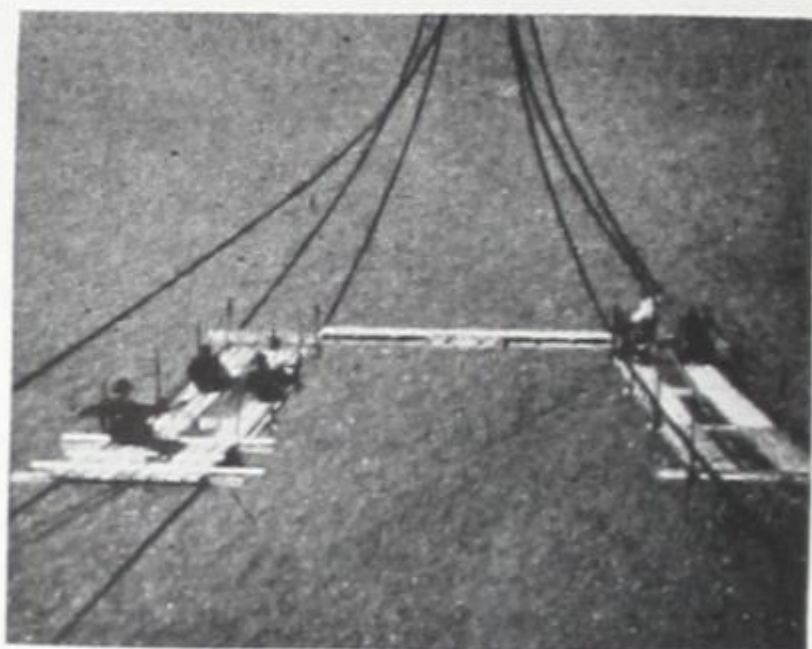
Erecting footbridges by sliding trains of platform sections down ropes from tower tops
